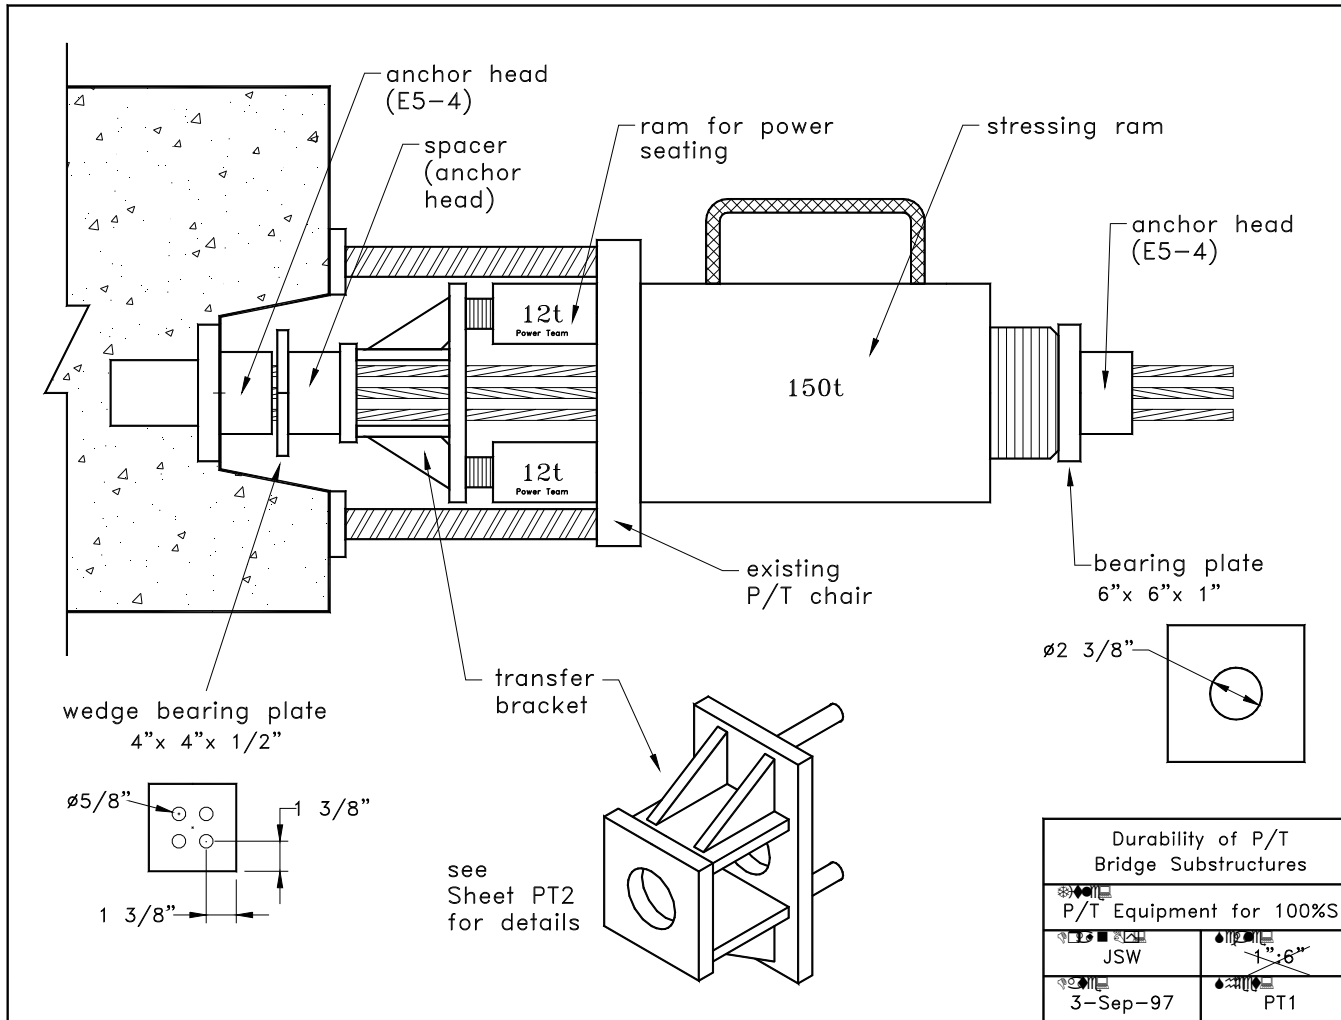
Sheet PT1: Post-Tensioning Equipment for 100%S Beams
